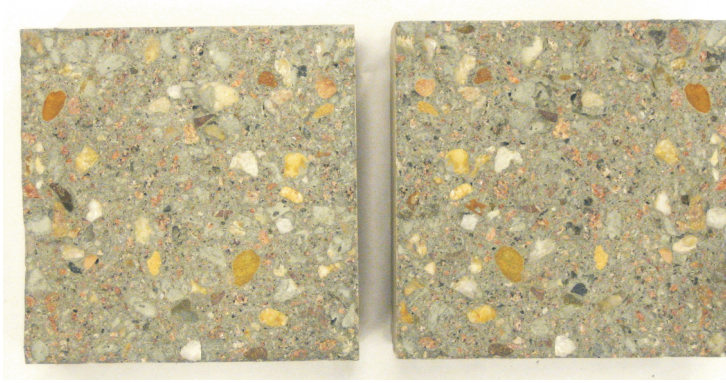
Example of the fracture surface of the splitting tensile test of mix C275.
